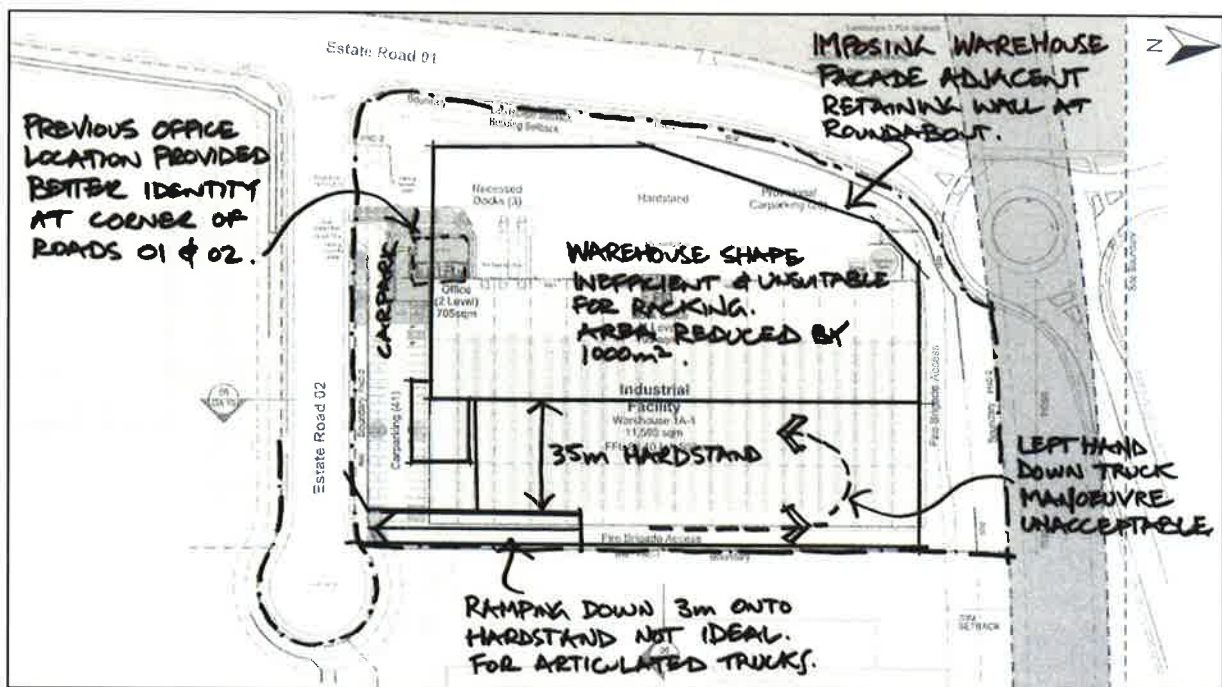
Mock-up Sketch Depicting the Orientation of the Lot 1A Loading Dock away From Estate Road 01
